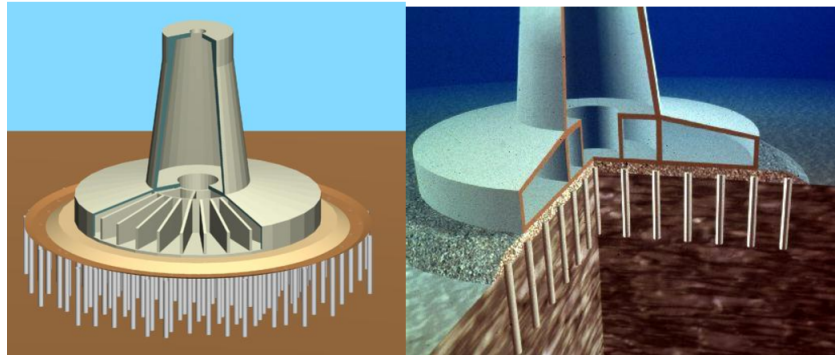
Foundation of a bridge pile (Pecker and Teyssandier, 2009)
